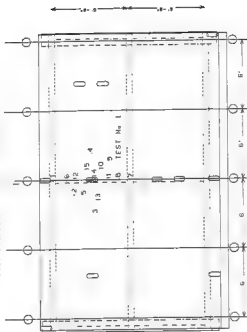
LVDI Locations (First Bridge - Test No 1)
